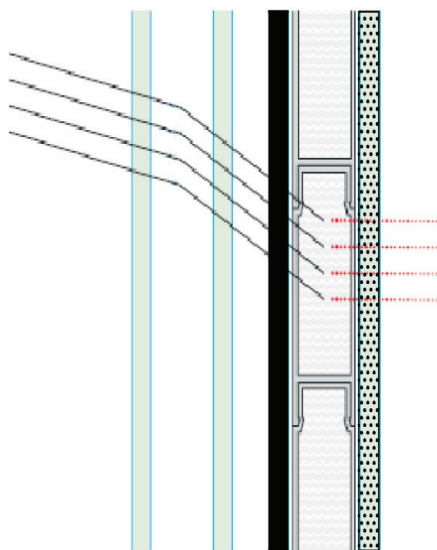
Construction detail of solar wall. The wall is heated during the day by incoming solar radiation, melting the PCM.
